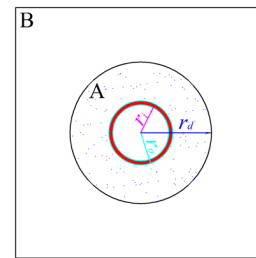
Typical cross-section of a cooling water pipe in mass concrete
